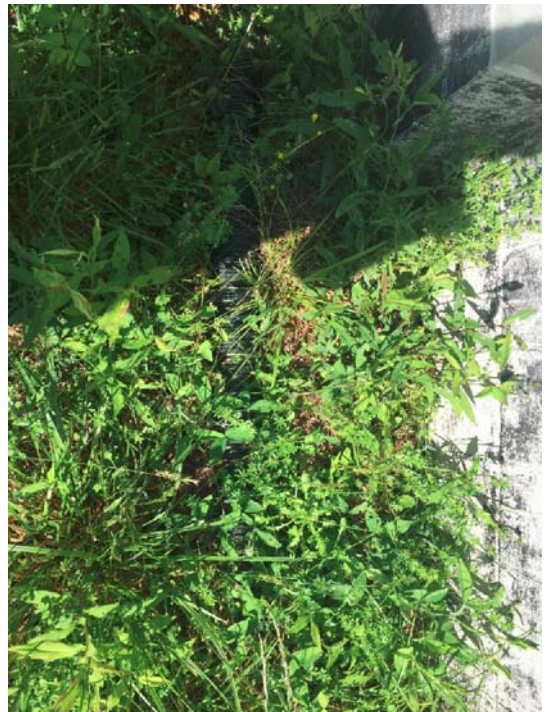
; Taken on 05/19/16 at 10:18 hours by START-JW. Facing Down. French Drain along the south wall of the building.
